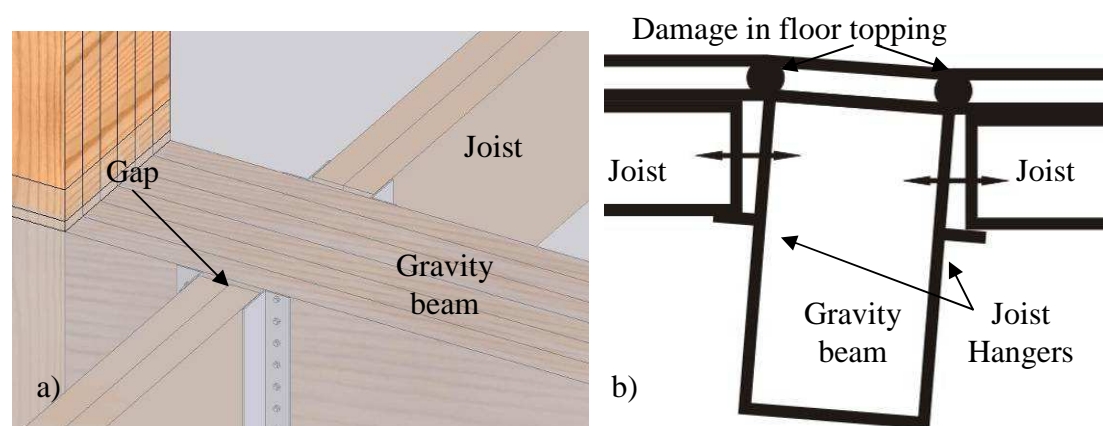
a) Joist connection with gravity beam b) Gravity a joist movement during lateral loading
